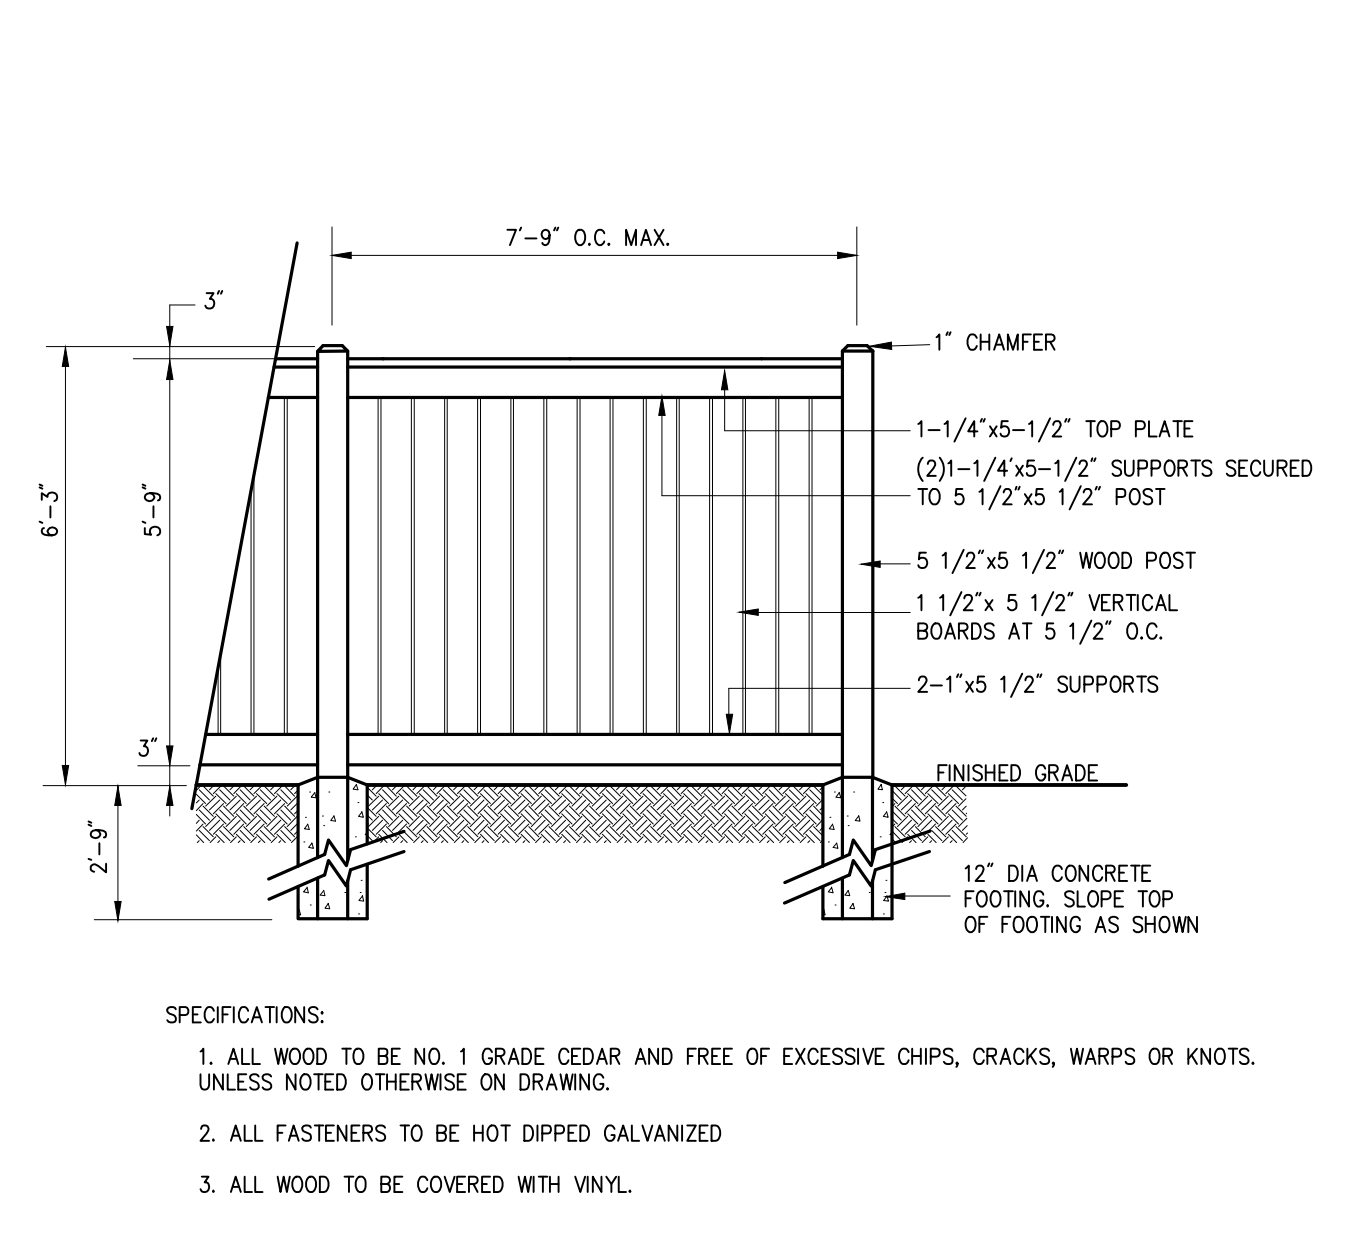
CONSTRUCTION FENCE BARRIER JDE
